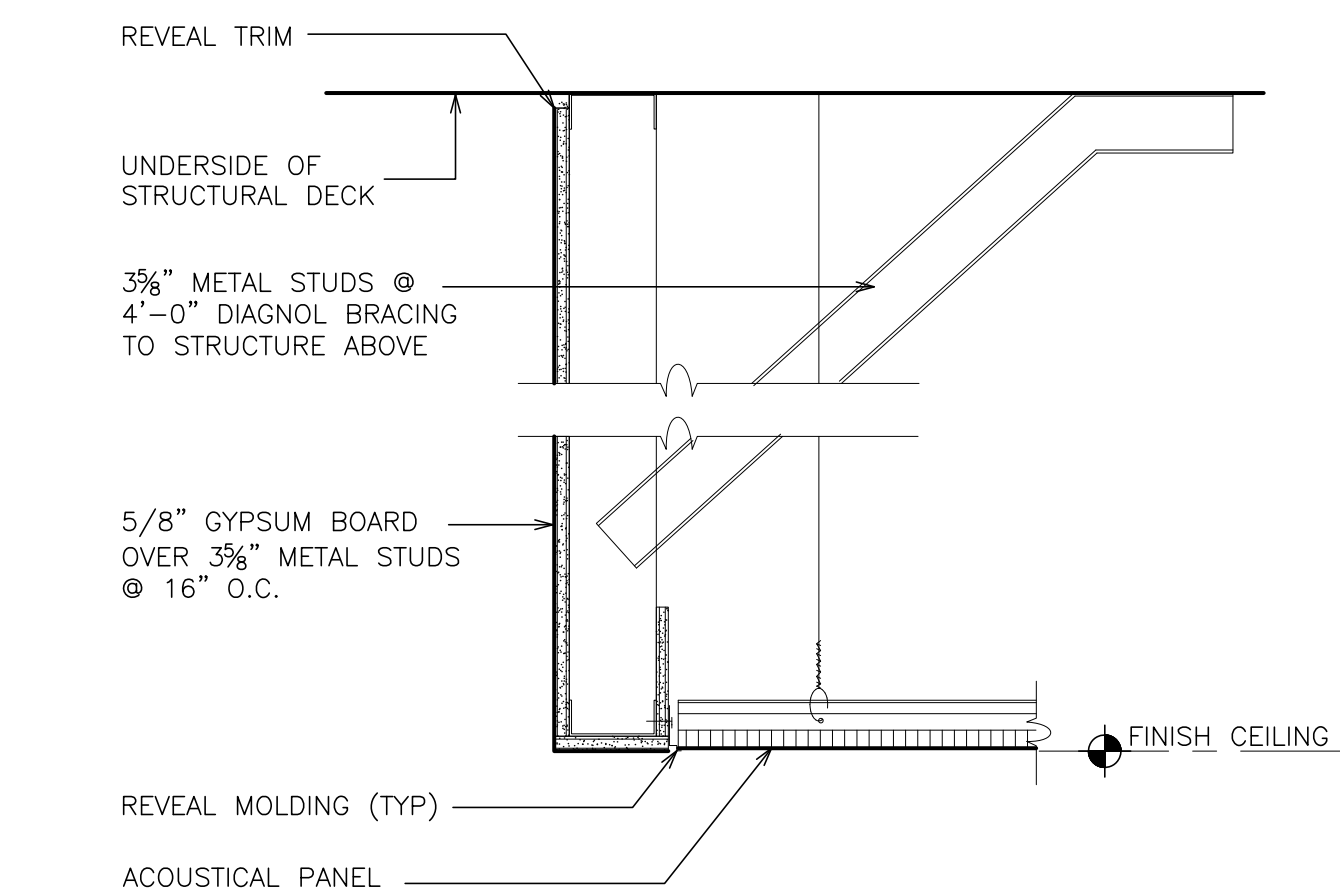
DETAIL - ACOUSTICAL CEILING TO DRYWALL SOFFIT
